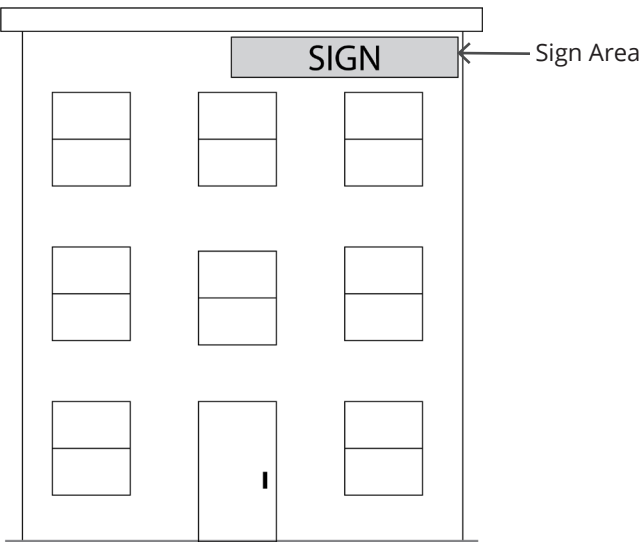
(1). Horizontally Oriented Building Identification Sign.
